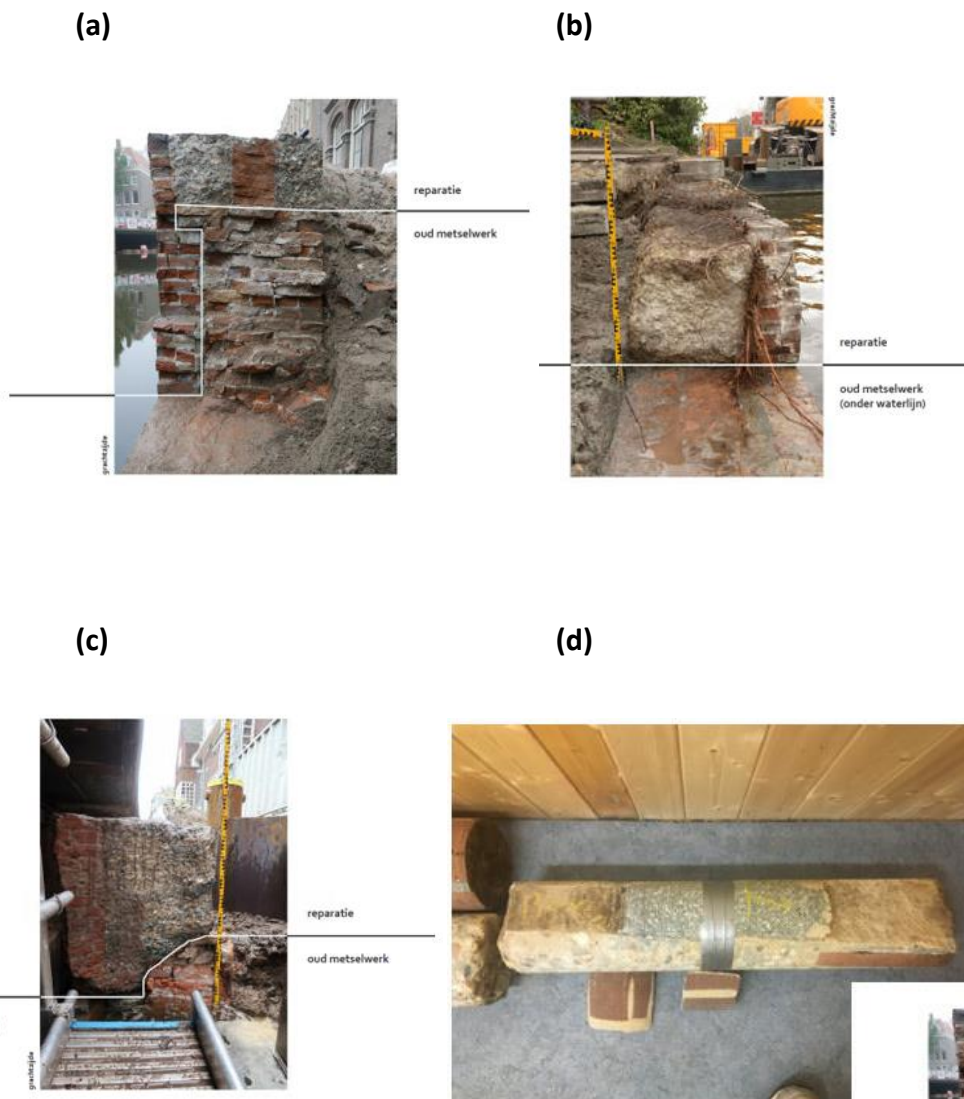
(a), (b), (c) and (d): renovation of quay walls in Amsterdam with concrete.
